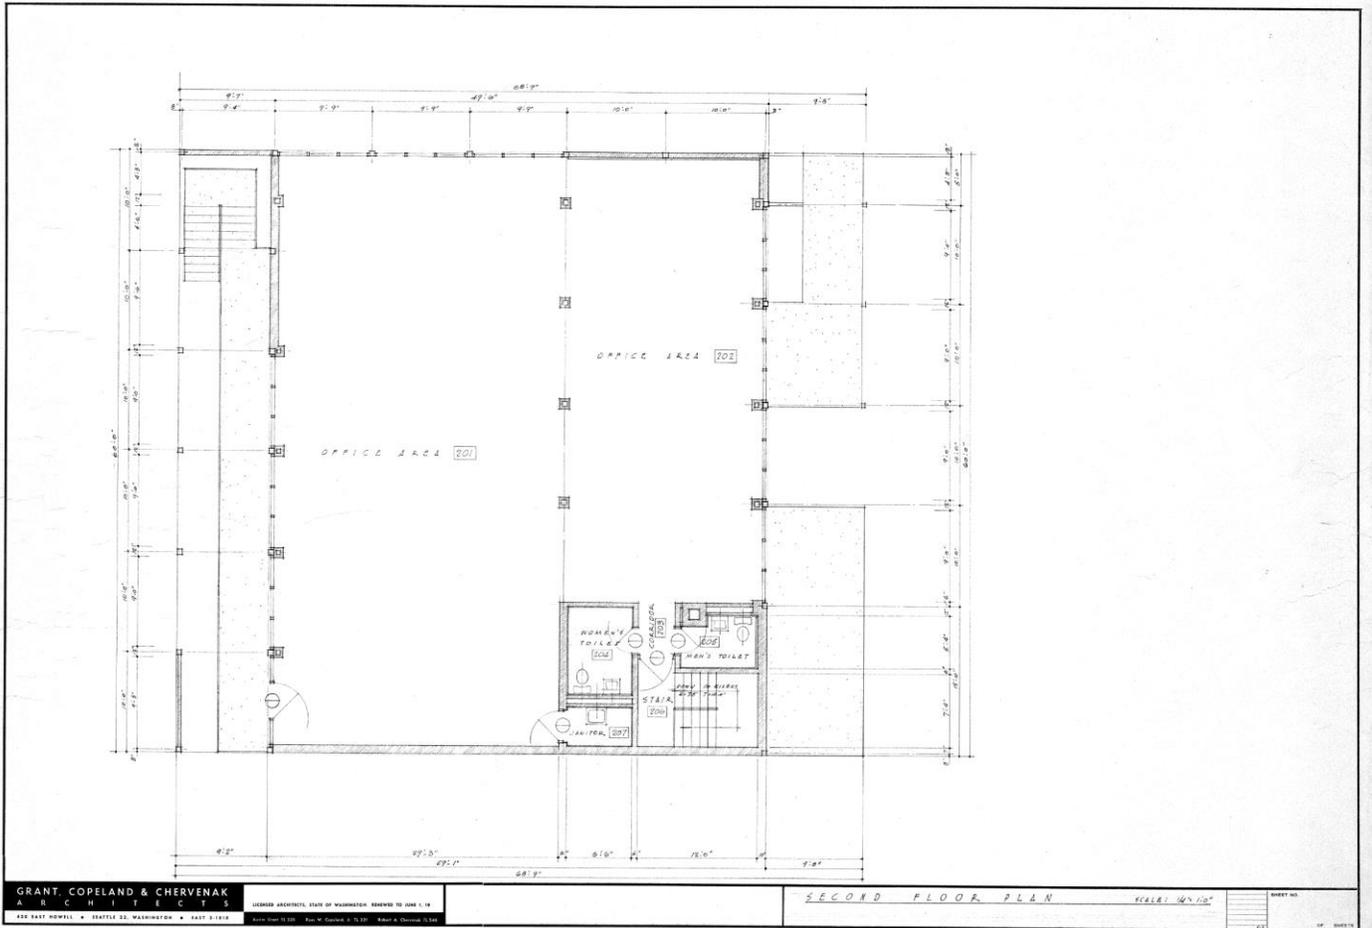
SECOND FLOOR PLAN (GRANT, COPELAND AND CHERVENAK, 1959)
